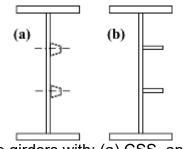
Plate girders with: (a) CSS, and (b) OSS.
